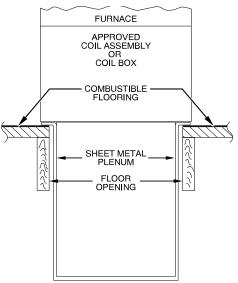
Furnace, Plenum, and Coil Assembly or Coil Box Installed on a Combustible Floor
